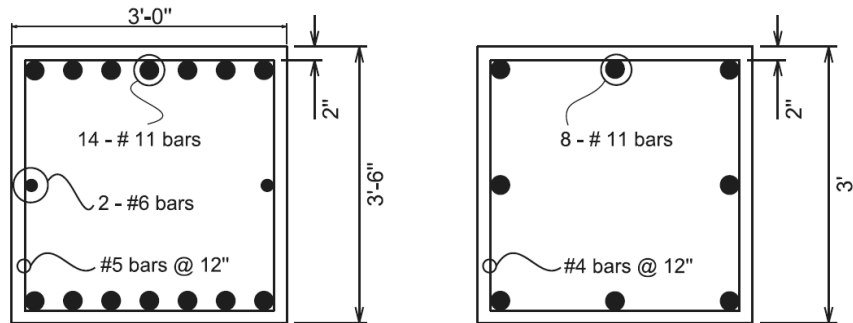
Cross-Sectional Layout for Bent Beam and Column for Multi-Span Simply Supported Steel Girder Bridge.
